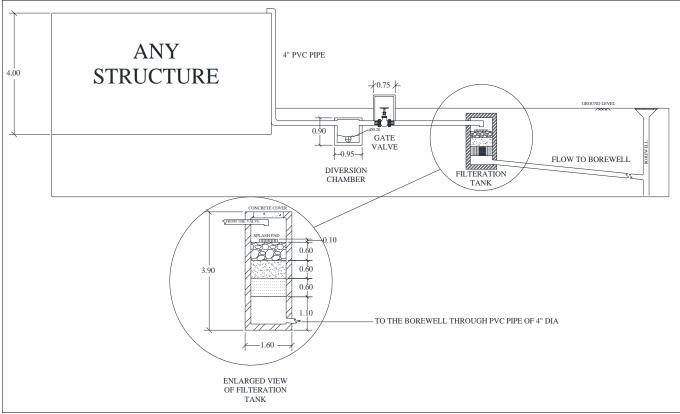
Rainwater Harvesting Concept (AutoCAD)
